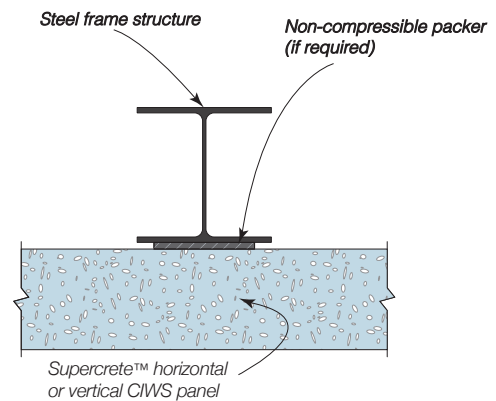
Horizontal bearing surfaces and steel support interaction detail.
